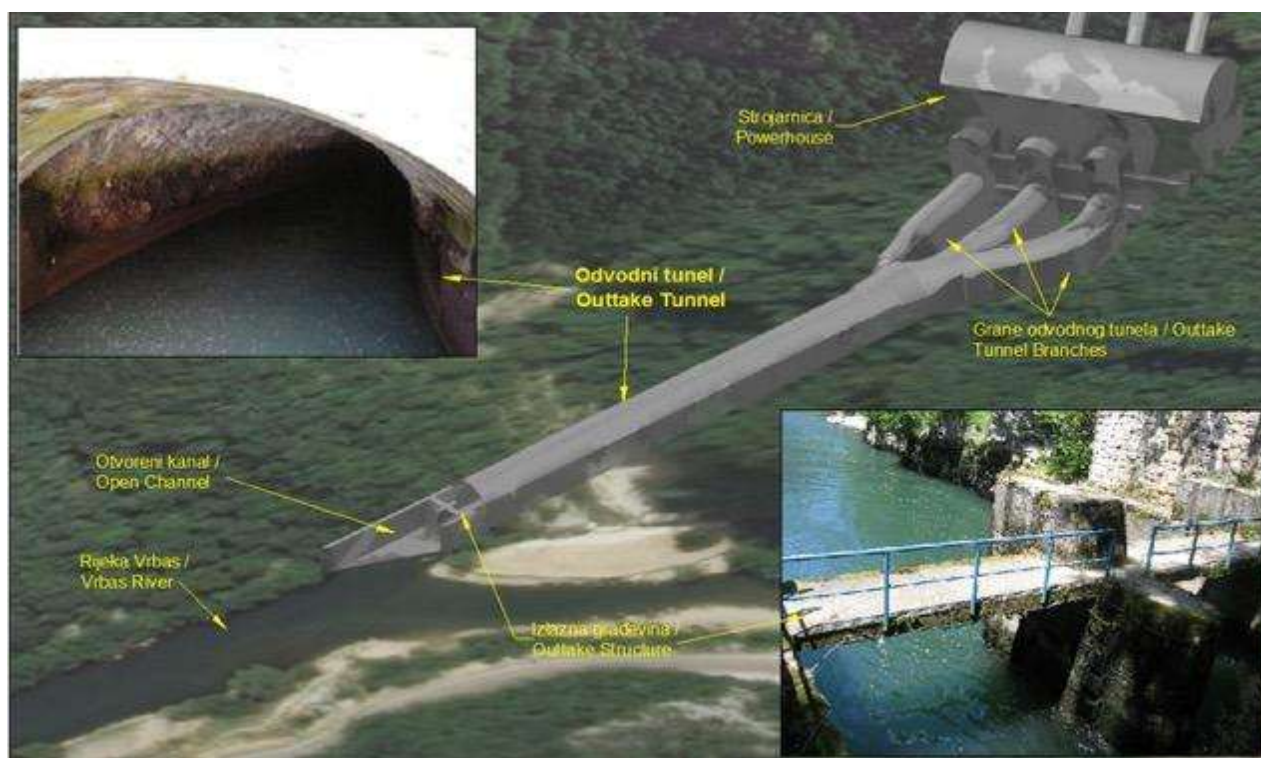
3D Perspective of the Underground Powerhouse, Tailrace Tunnel, and Its Connection to the Vrbas River
